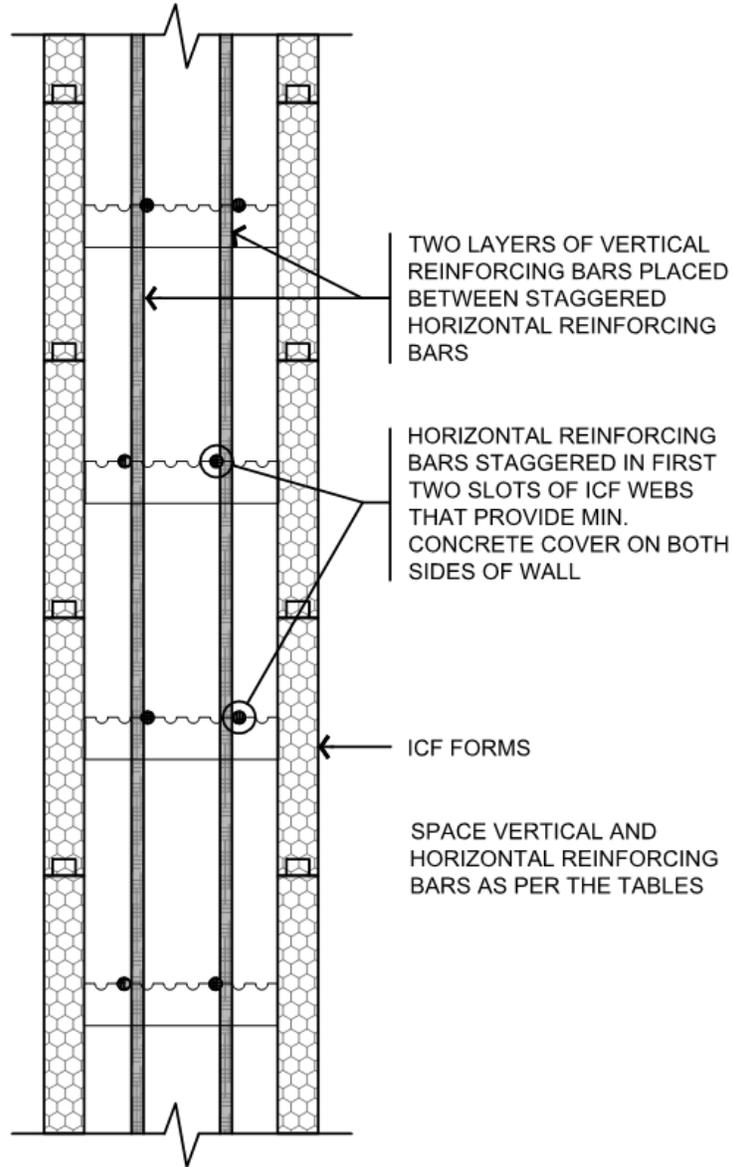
Below Grade Wall Reinforcing Placement for All Wall Thicknesses.
